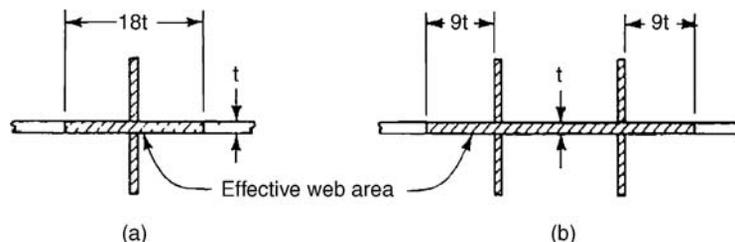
Effective column areas for design of stiffeners: (a) for one pair of stiffeners; (b) for two pairs.
